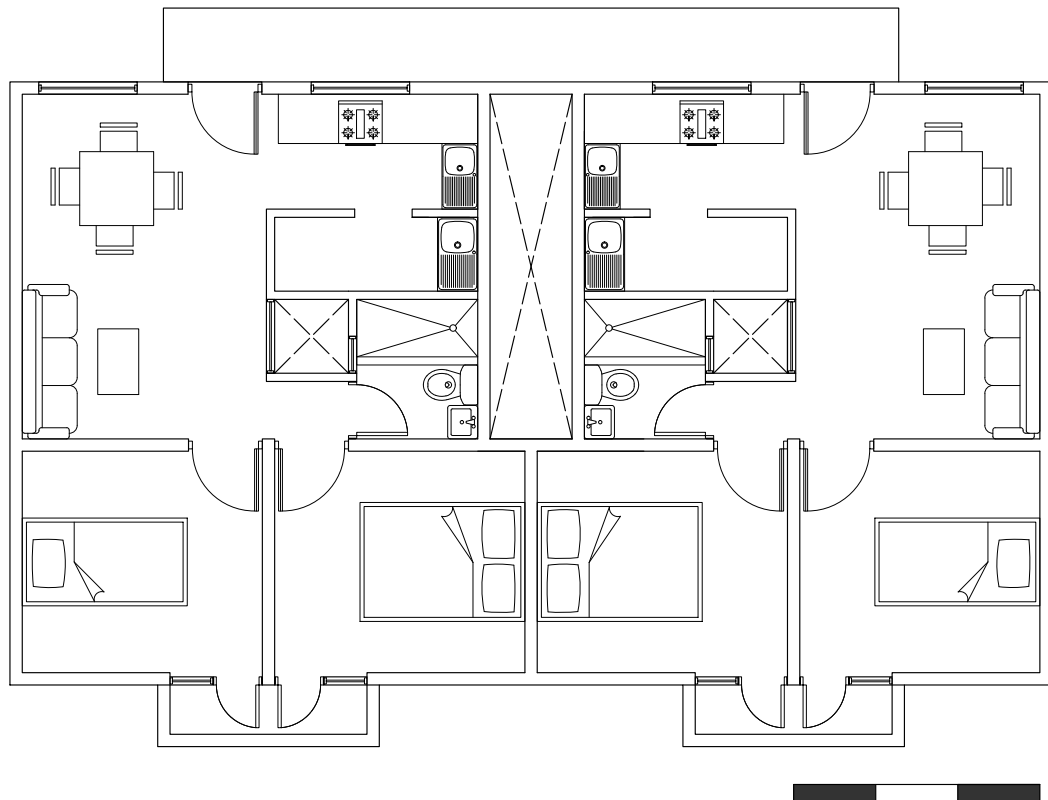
Floor Plan (60m2) Diagram, Cañada del Real (Elaborated by author)
